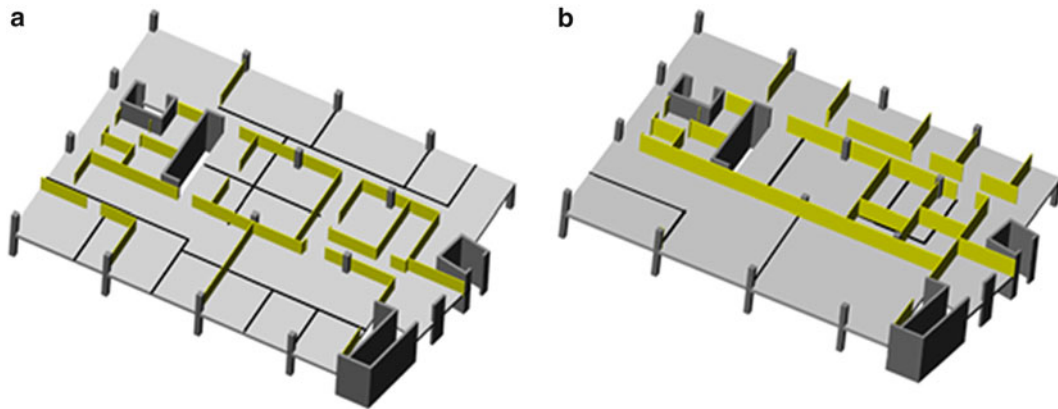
(a) First floor internal partition layout. (b) Second floor internal partition layout
